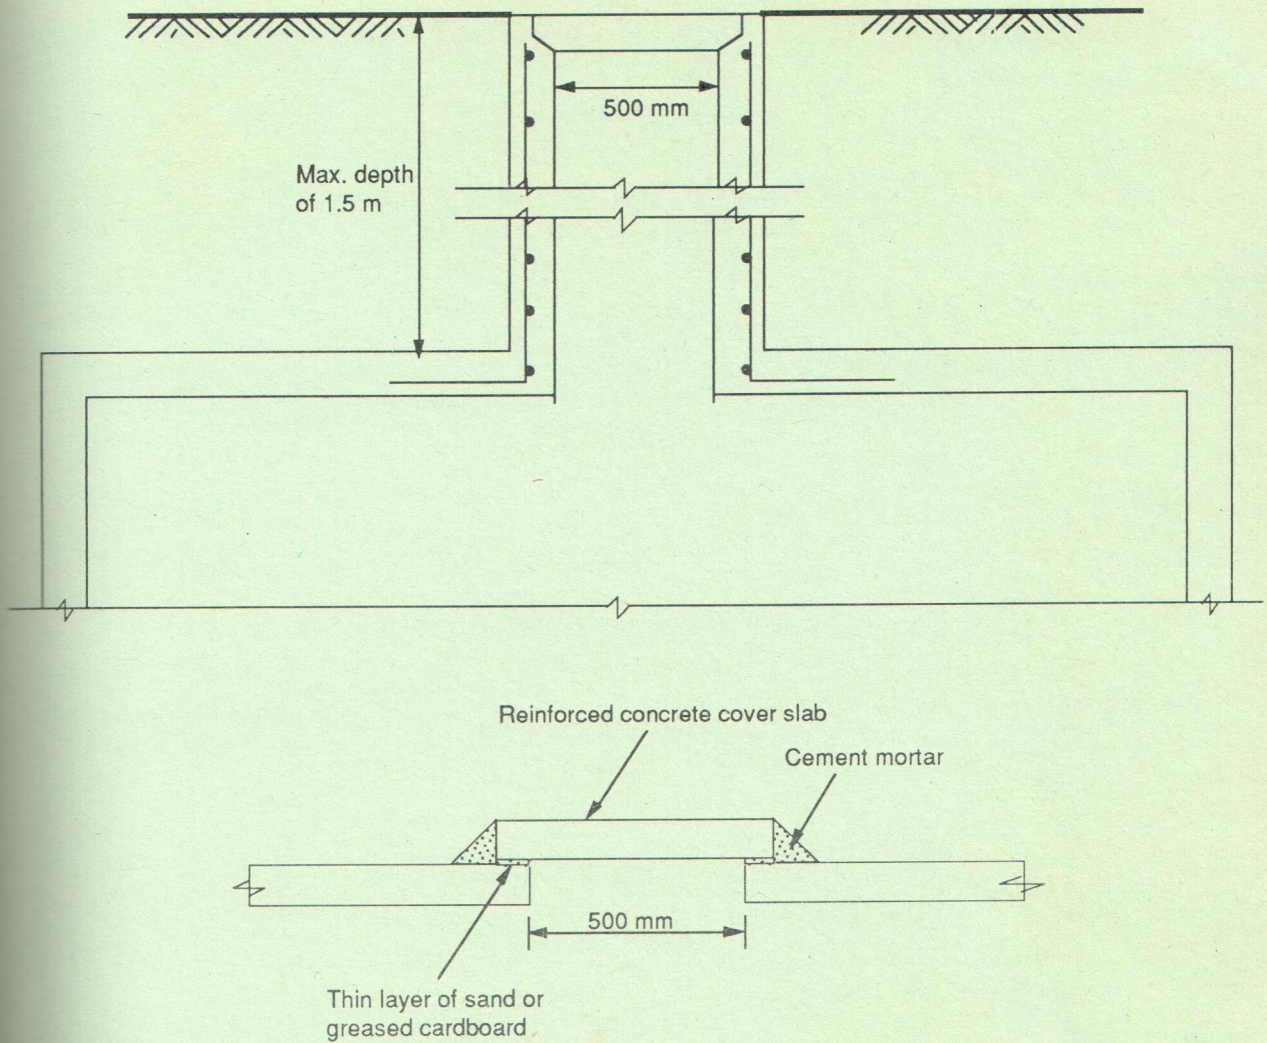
C TWO ALTERNATIVE METHODS OF PROVIDING MANHOLE COVERS
